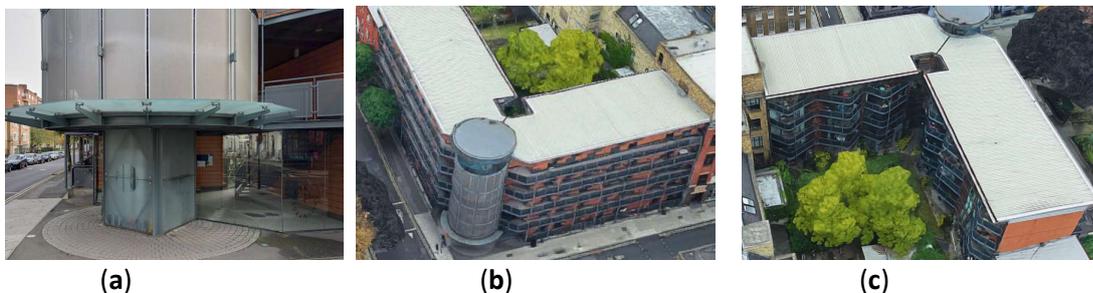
Views on the Murray Grove building: (a) Entrance, (b) Front façade, (c) Back façade (Google Maps).
